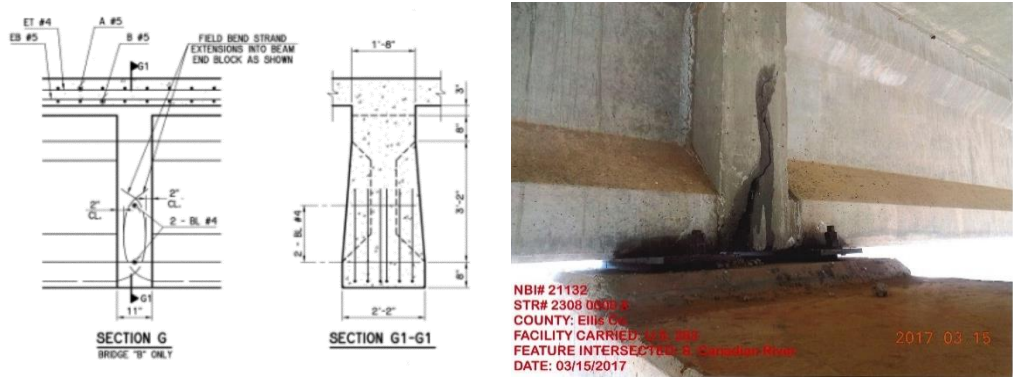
Detail for a typical continuity linkage block used in Oklahoma (left) and photo of a linkage block exhibiting cracking from restraint induced moments (right)
